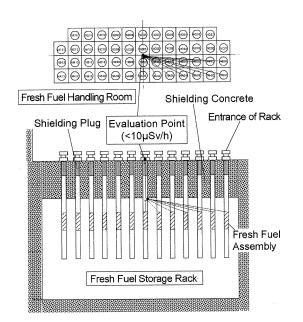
Shielding Design Requirement for Fresh Fuel Storage Rack
